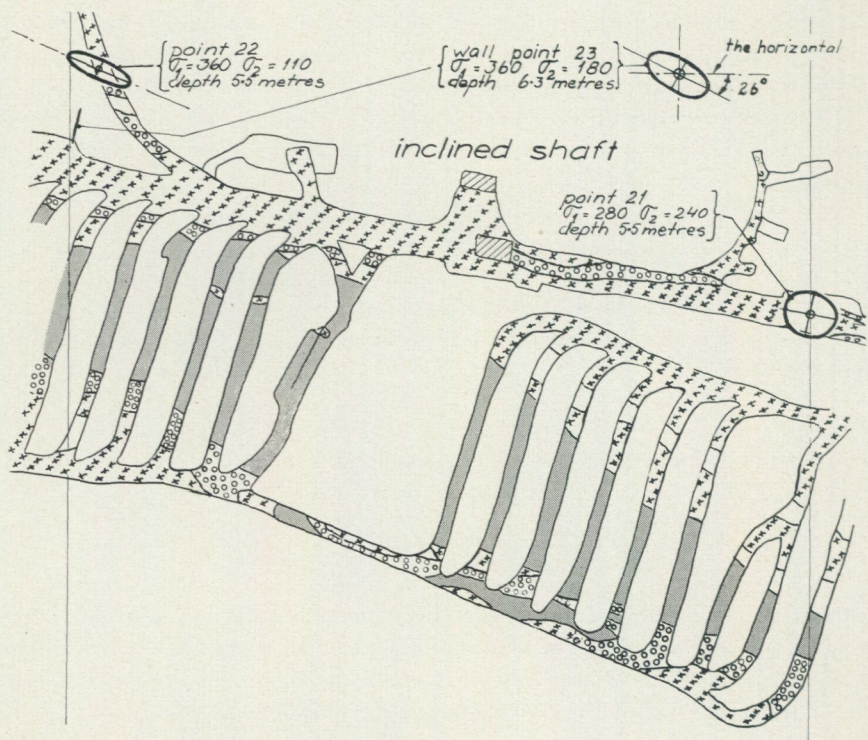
460 metre level with roof points 21, 22 and wall point 23.
